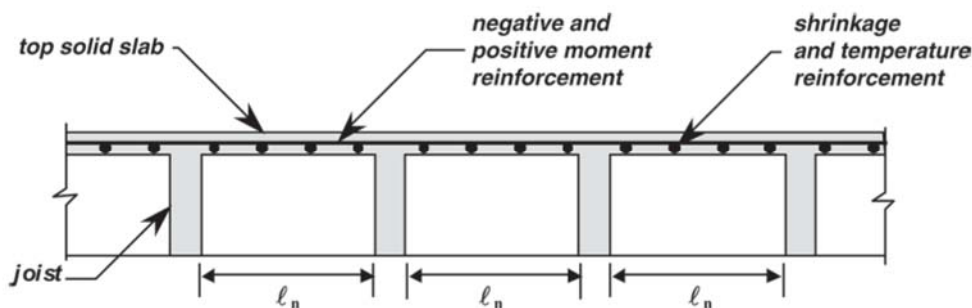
Reinforcement of top solid slab that spans between joists.
